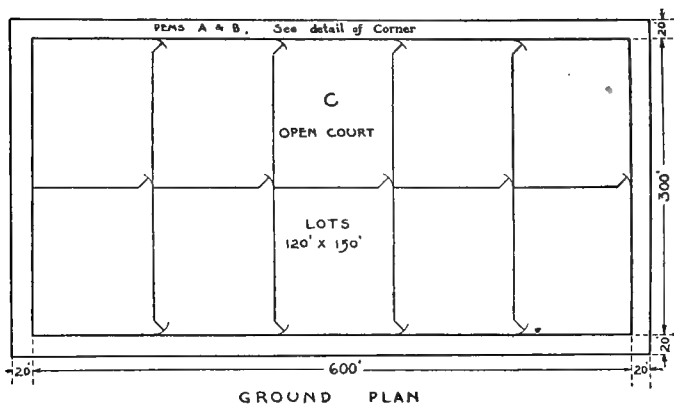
Floor Plan of Open Court Lambing Shed.
